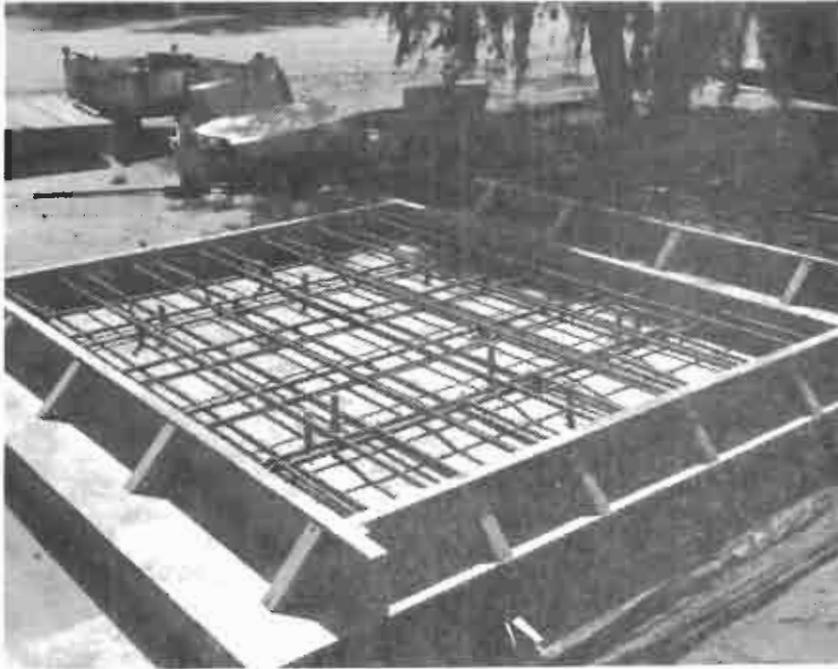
Simulated Bridge Decks Prior to Concrete Placement.
